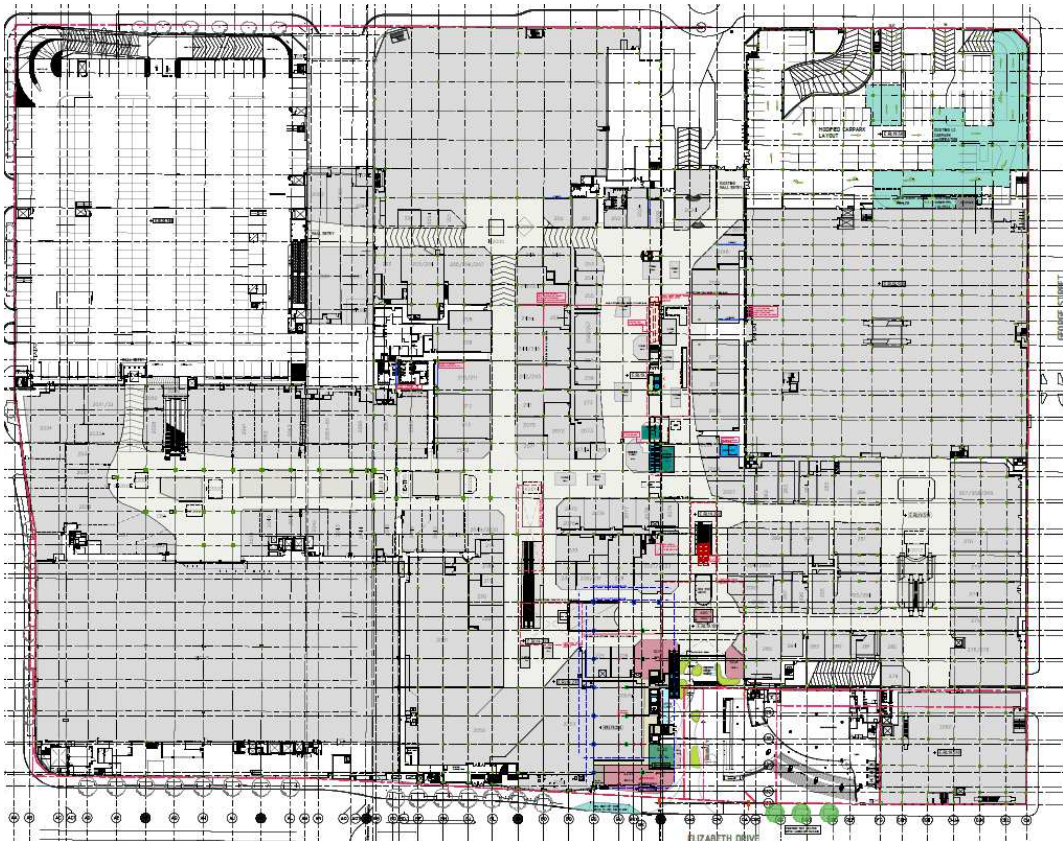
Plan showing the proposed new construction on existing Ground Level (Retail Level 2)
